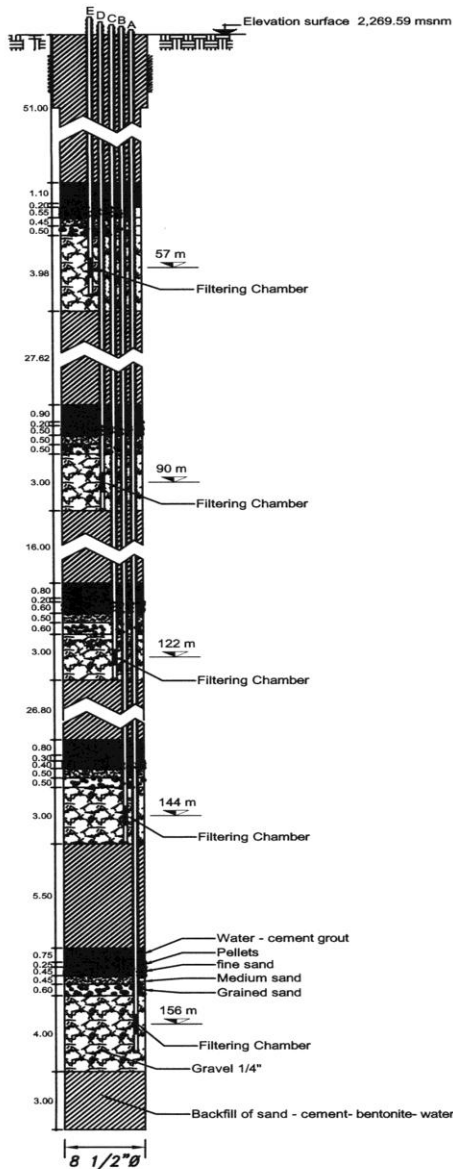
Station with open-type piezometers existing at the site (CFE, 2008)
